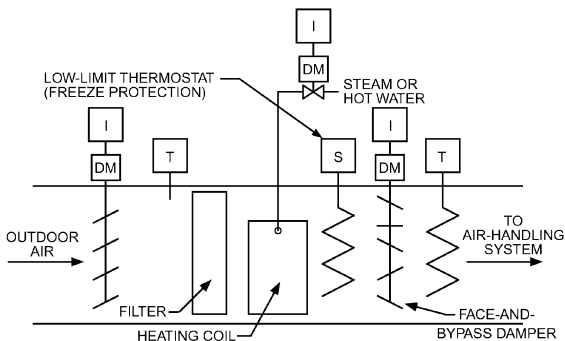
Preheat with Face and Bypass Dampers [2015A, Ch 47, Fig 5]
